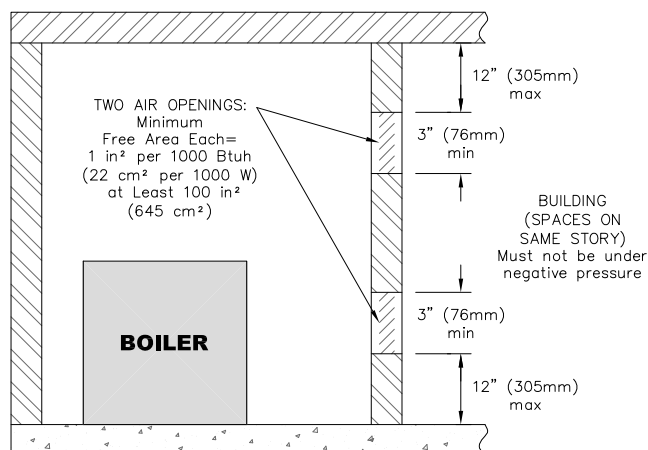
Air Openings – All Air from Indoors on the Same Floor
